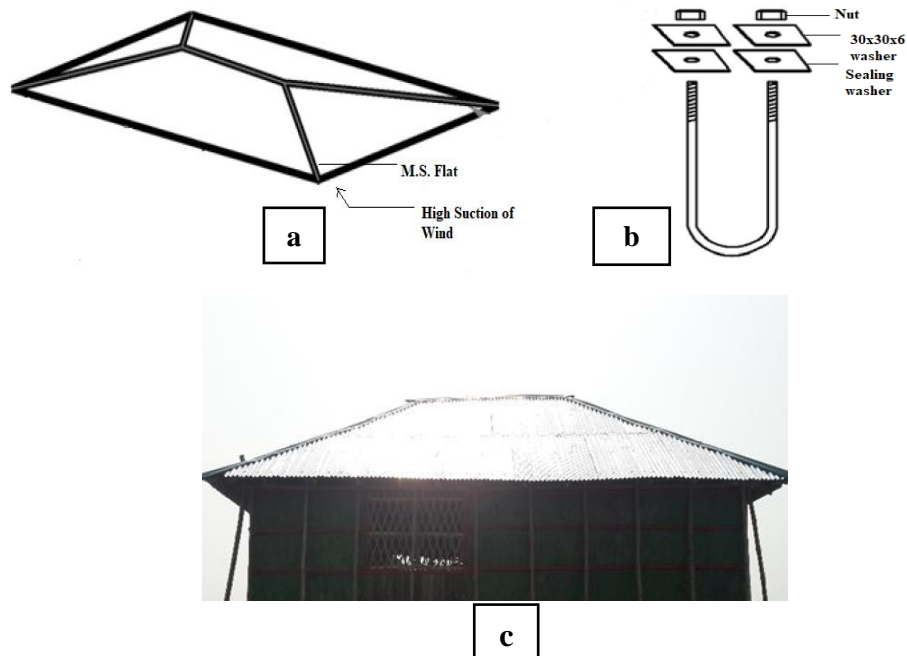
CGI sheet layer of the roof. (a) Using reinforcing bands in high suction zones (b) U bolt – cyclone connection for roof cladding to purlins (c) Completed roof layer
